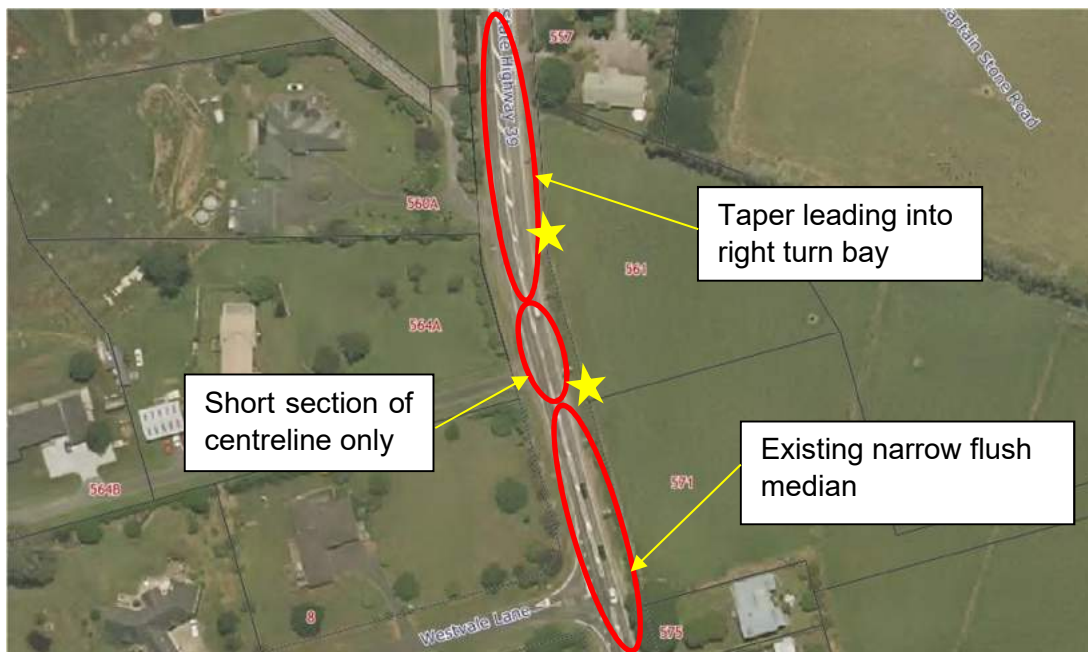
Horotiu Road Layout (yellow star = proposed vehicle crossings)
